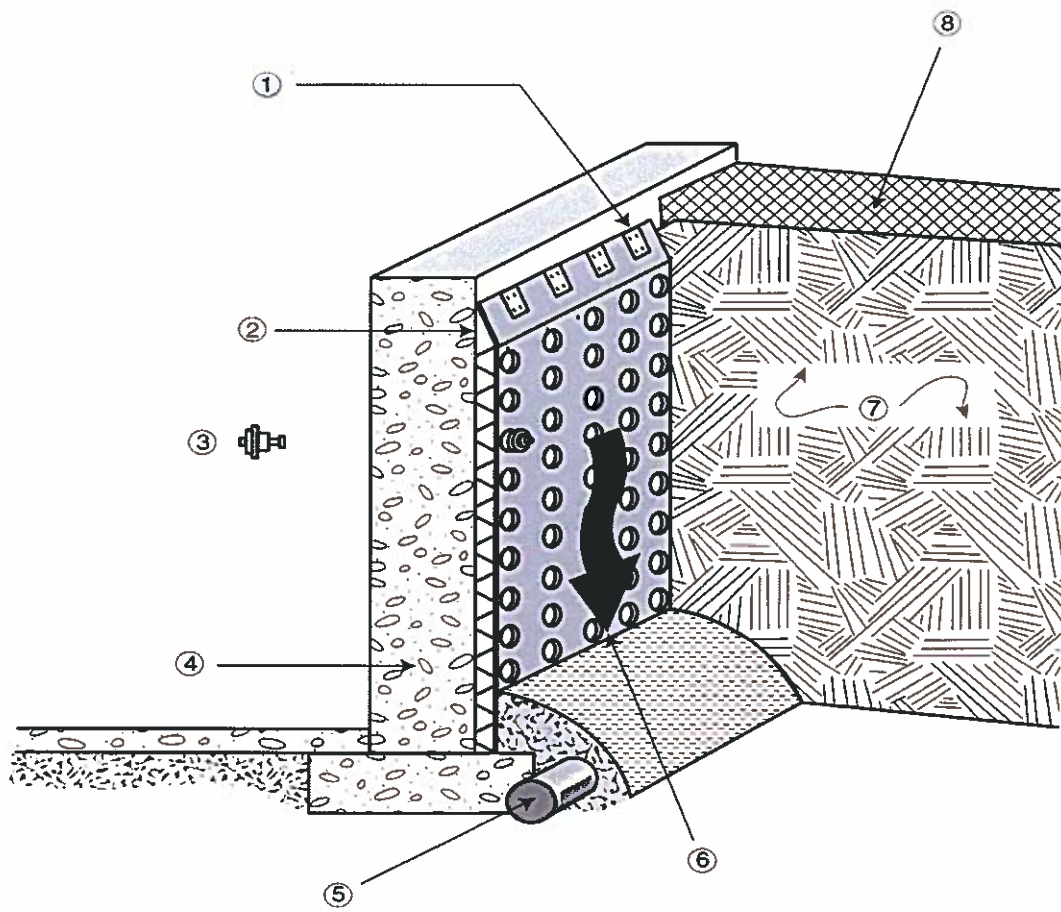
Installation details for the “Platon Dampproofing Membrane”
